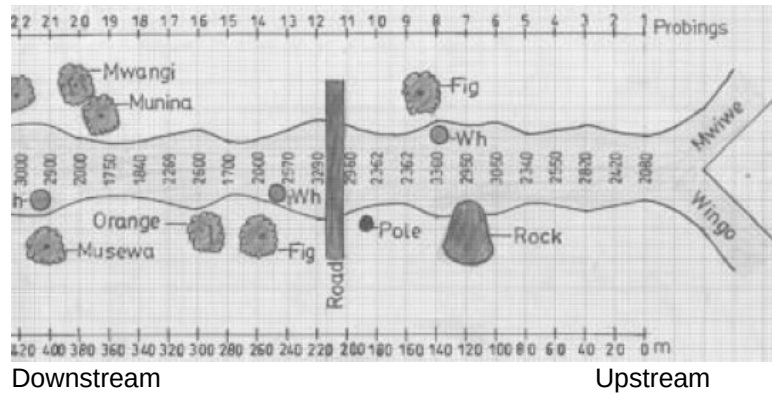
Example of a plan of a river section (Nissen-Petersen, E. 2006).
